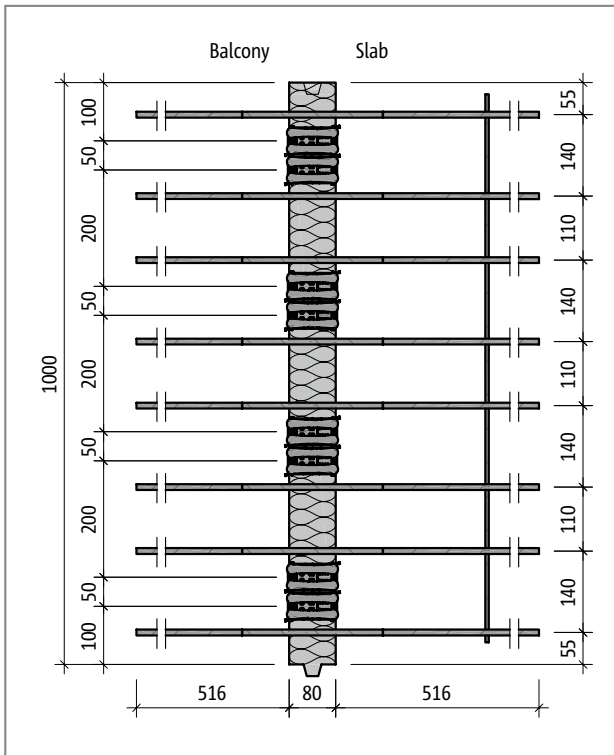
Schöck Isokorb® T type Q-E-V5: Product layout
